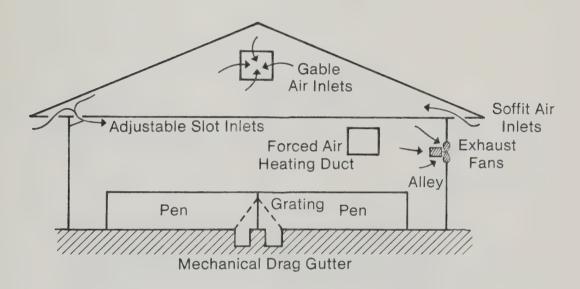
An end-view schematic of barn SO-2 showing some ventilation and structural details.
